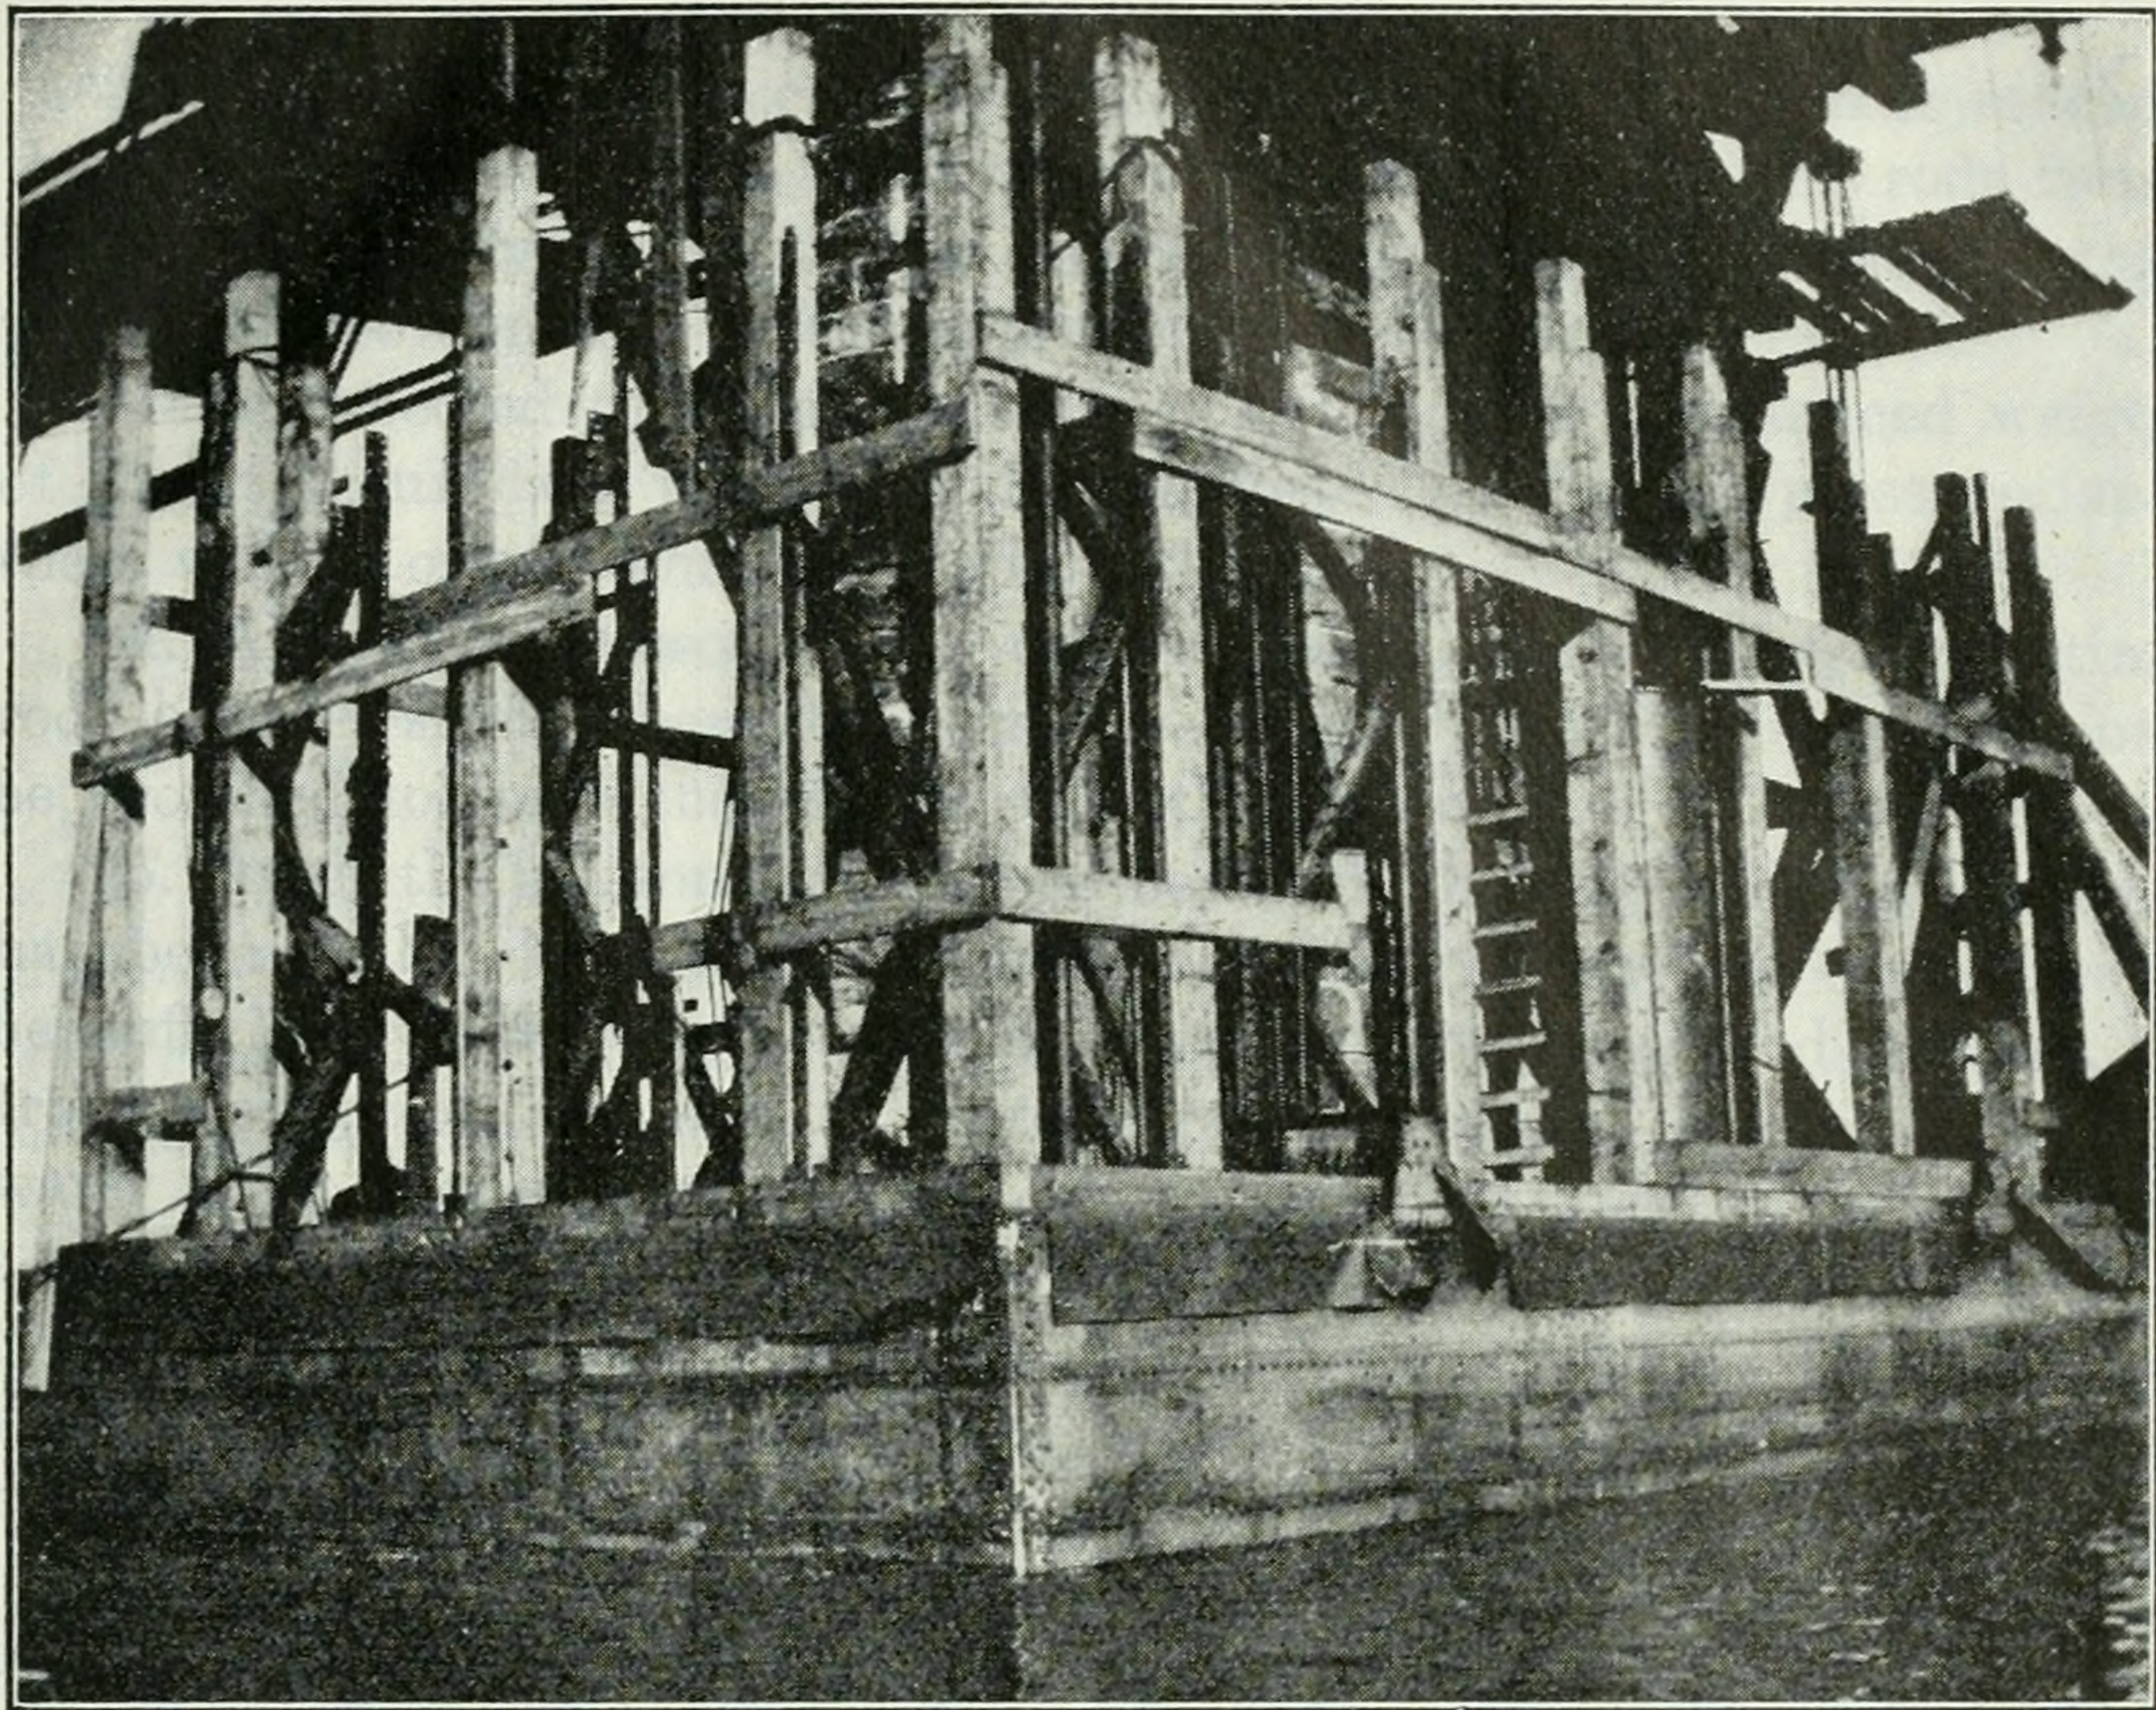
LOWERING COFFER-DAM AROUND PIER 3.
